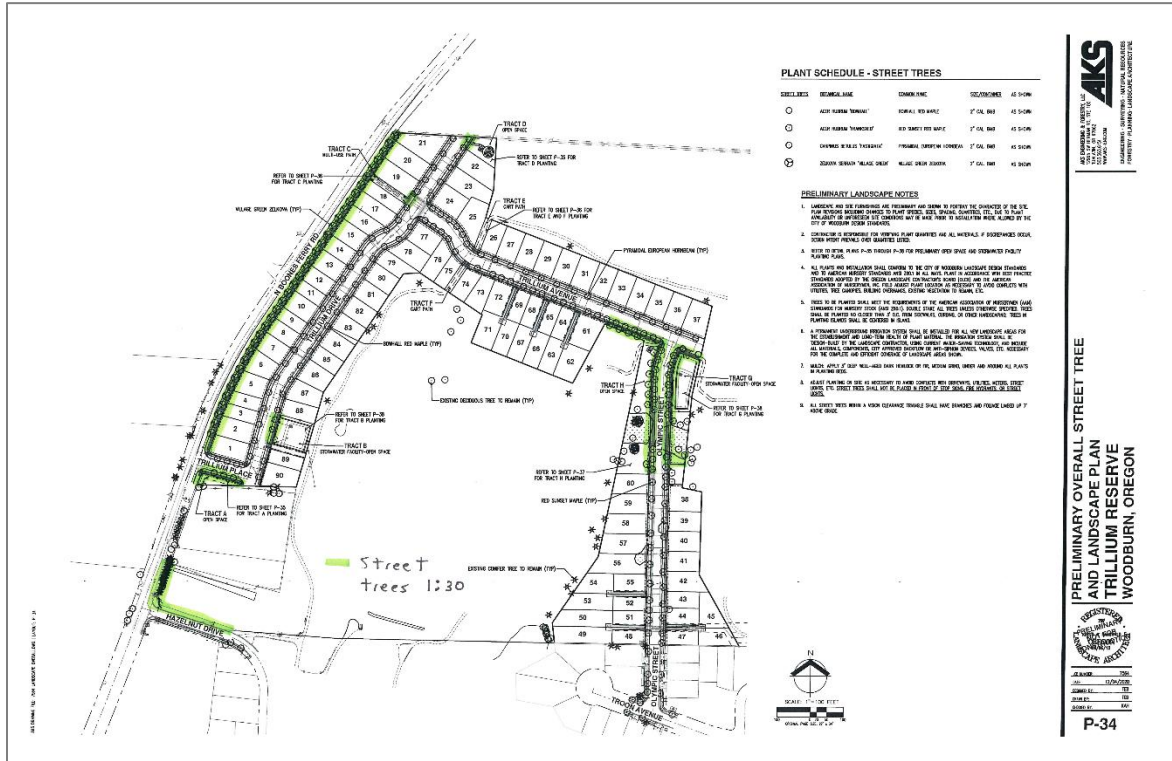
Street Tree Min No. (green: equal to 1 tree per 30 ft of block frontage)
